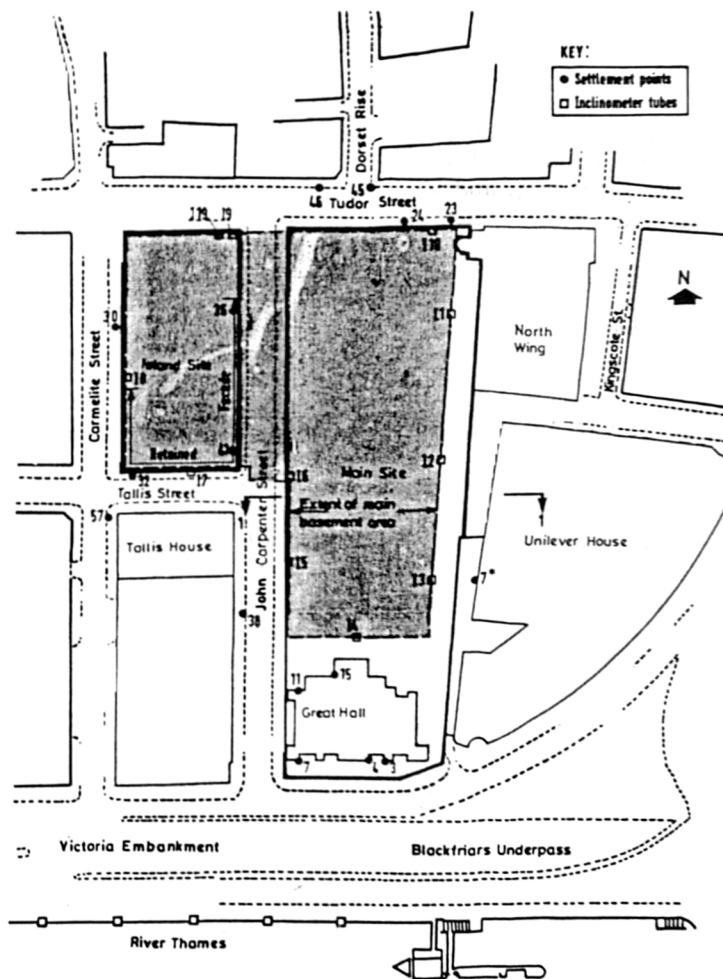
Plan on site at 60 Victoria Embankment (St John et al, 1993).
